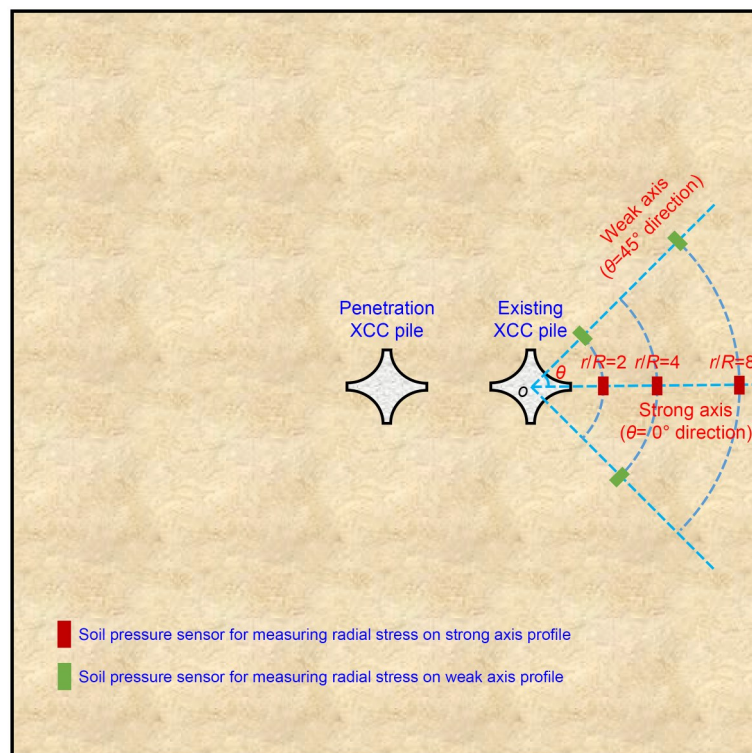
Plan view of soil pressure sensor installation at various measurement depths. θ is the layout direction of soil pressure sensor
